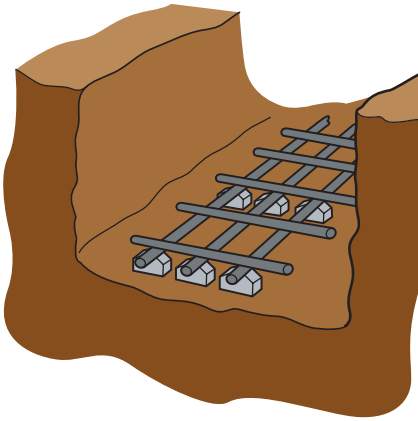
Long bars underneath when steel mesh is laid at the bottom of foundation concrete
